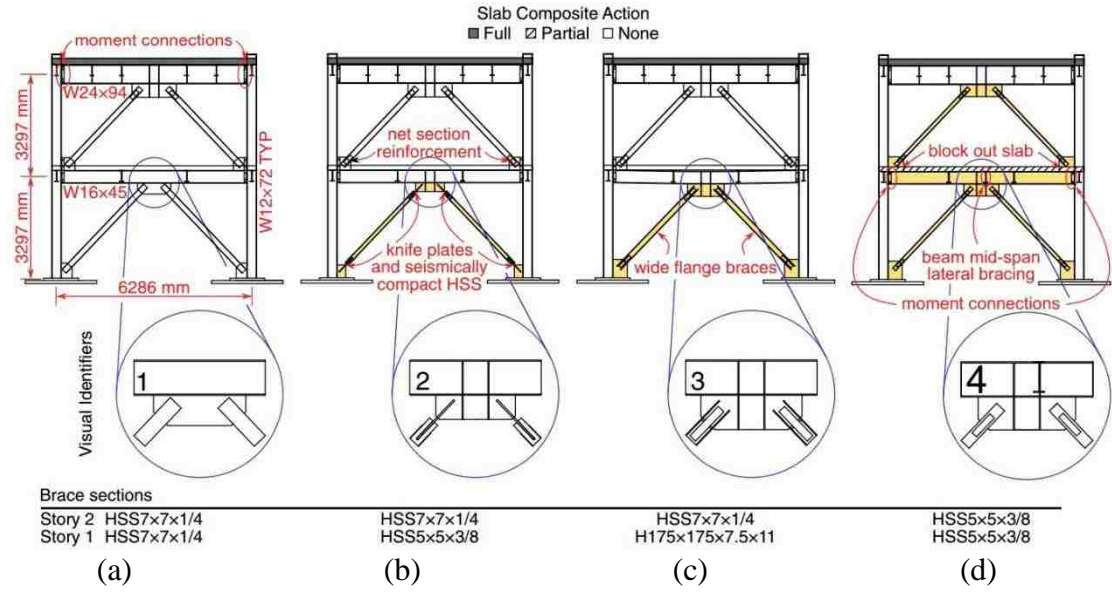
Specimen elevation, typical sections and geometry: (a) Specimen 1; (b) Specimen 2; (c) Specimen 3; (d) Specimen 4 (Sen et al. 2016a)
